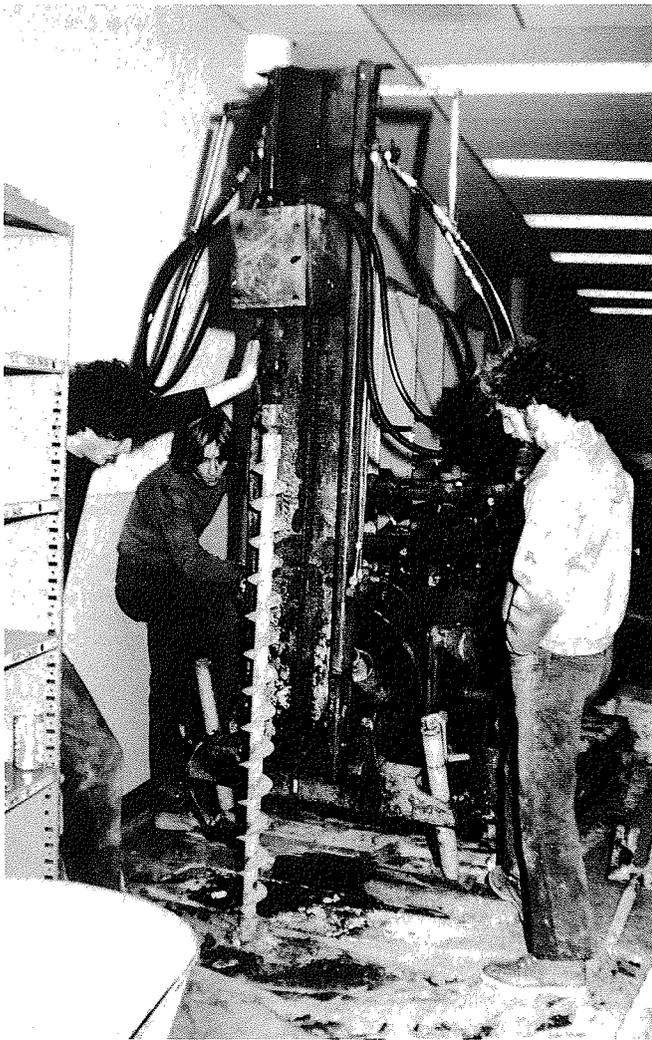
Drilling beneath the floor slab at borehole A inside the One Lombard Building, adjacent to room 29.
